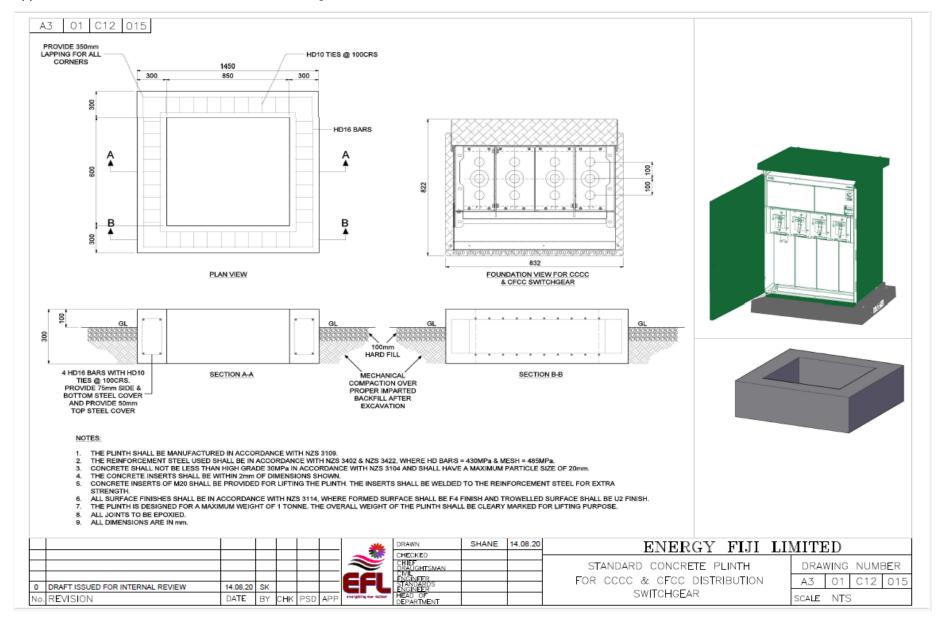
Foundation plan and elevation for a standard switchgear plinth
